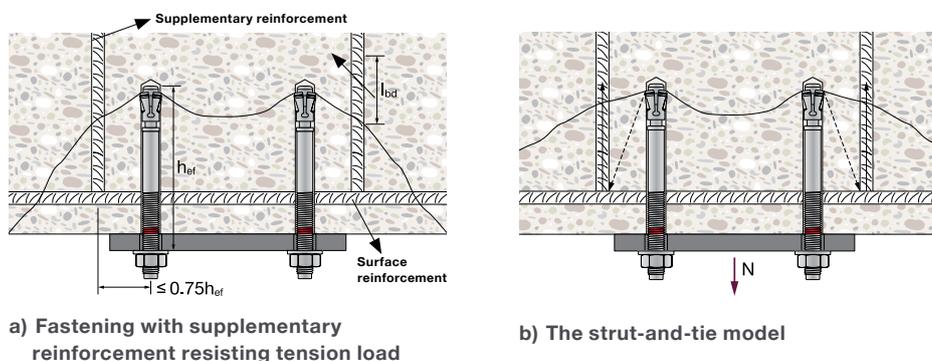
Supplementary reinforcement with post-installed anchors
